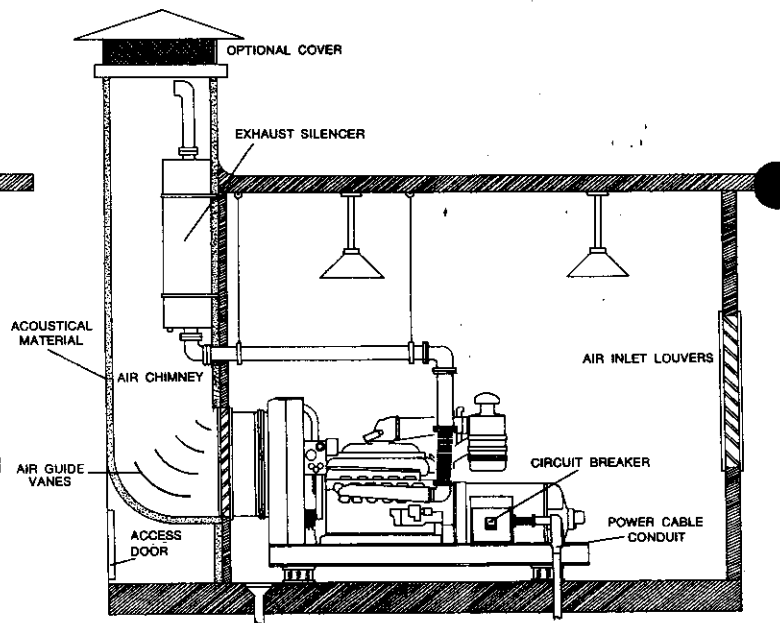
RADIATOR AIR DISCHARGING INTO SOUND-INSULATED STACK CONTAINING EXHAUST SILENCER
